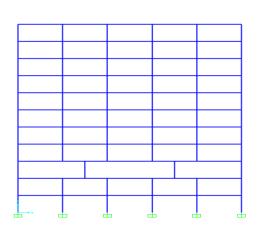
Model 4 - Building with floating column at 2<sup>nd</sup> floor
